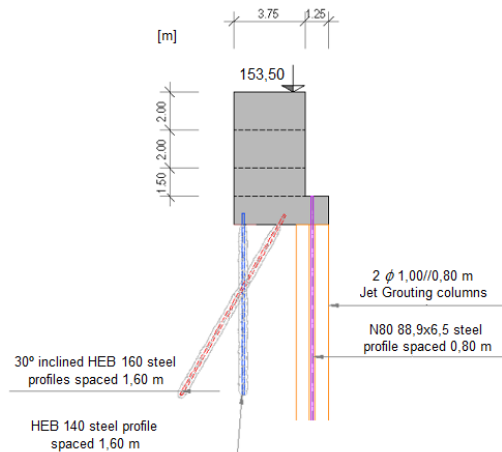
Wall geometry and foundation solution adopted for the left abutment and middle section of the cofferdam (adapted from Pinto et al., (2014)).
